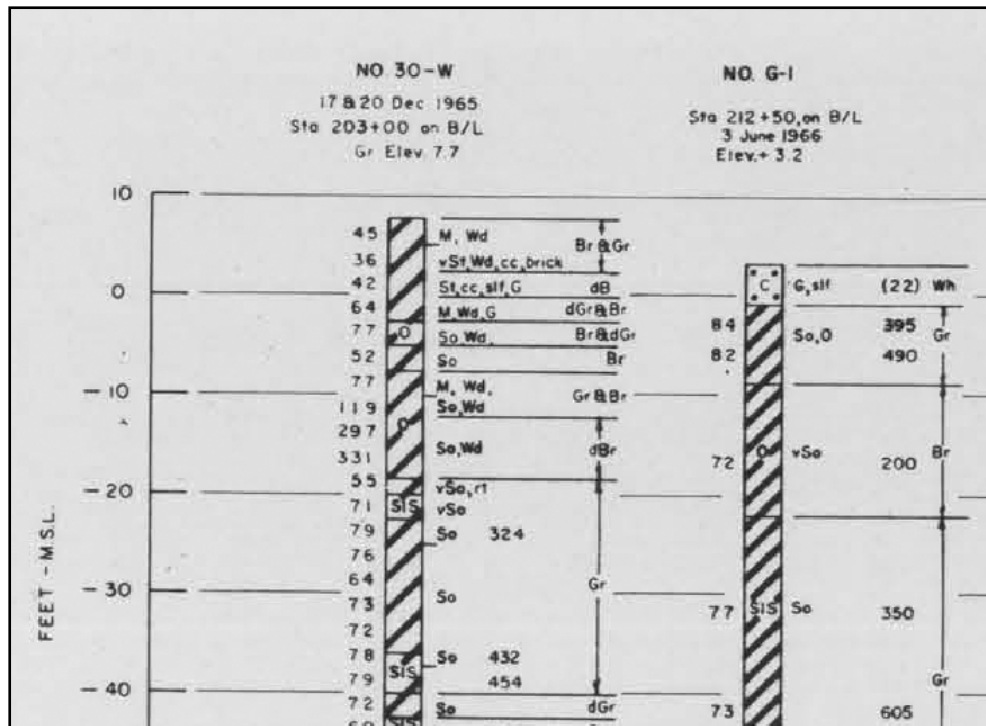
Nearest Boring G-1 Shows Sandy Material at Original Ground Surface (may have provided a zone facilitating levee failure)
